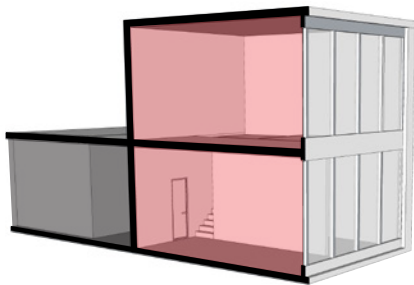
typical 1 - 2 bedroom apartment.
